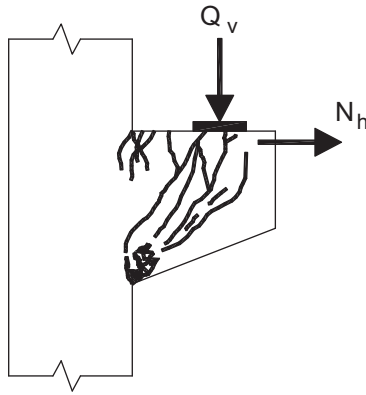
Cracking pattern near failure load for high-strength reinforced concrete corbels.
